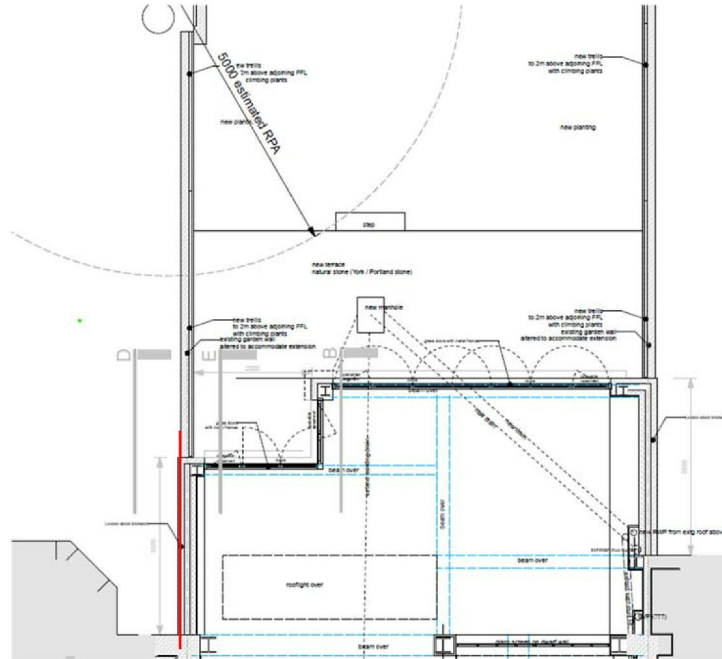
Ground floor plan as Proposed (Webb Architects Limited)
